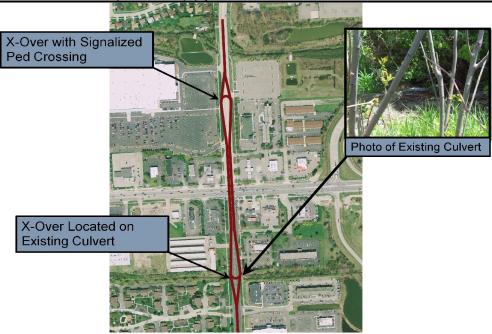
Potential Boulevard Section on Haggerty Road at M-153
